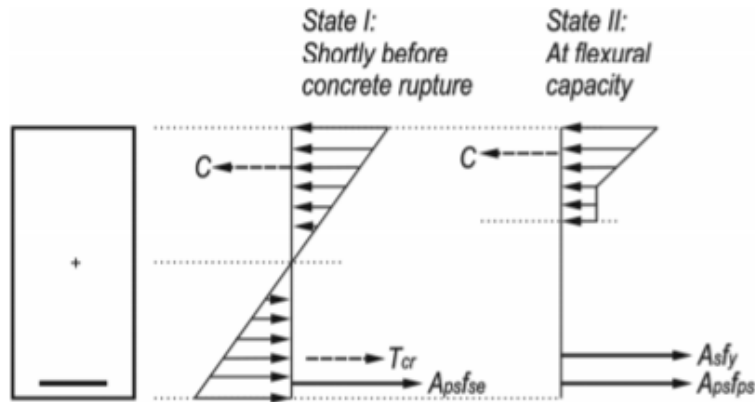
Forces Present in Reinforced Concrete Member at Varying Load States from Brenkus and Hamilton (2014)
